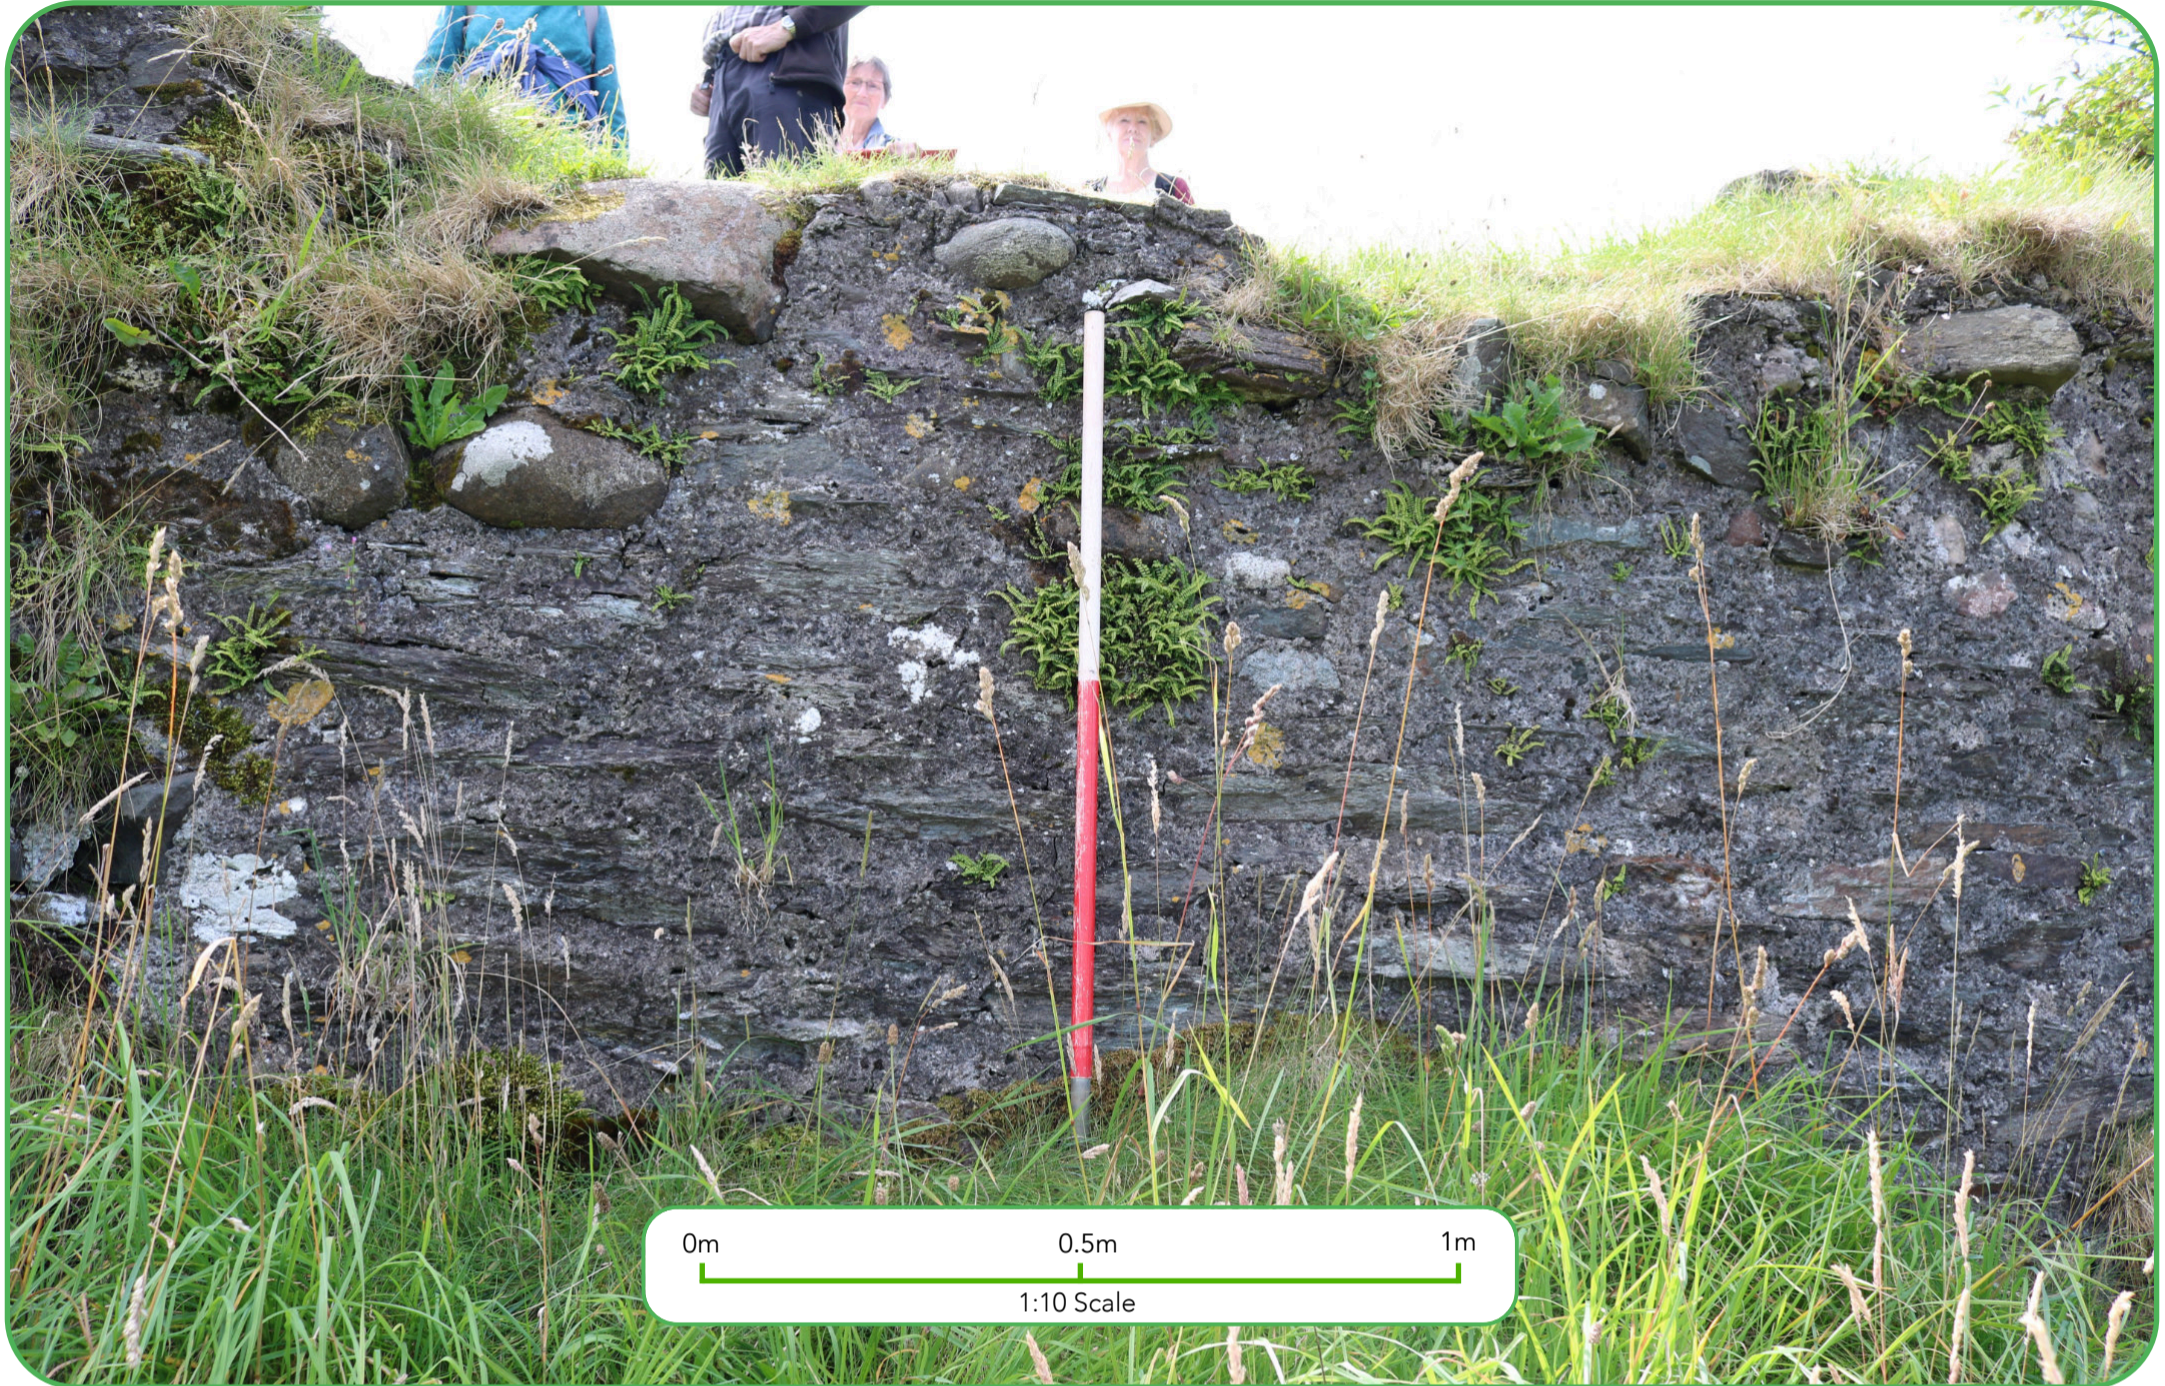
Elevation 2 - North facing elevation of consolidated walling.
